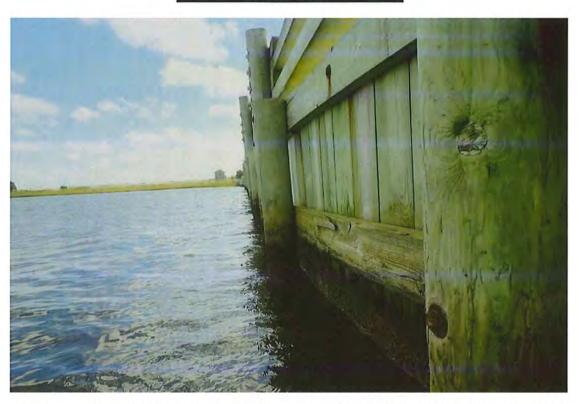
Northeast wingwall bulkhead between 1st & 2nd piles from west, split in middle wale.
